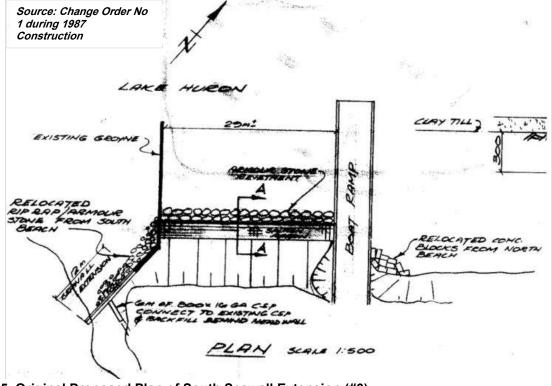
Original Proposed Plan of South Seawall Extension (#3)
